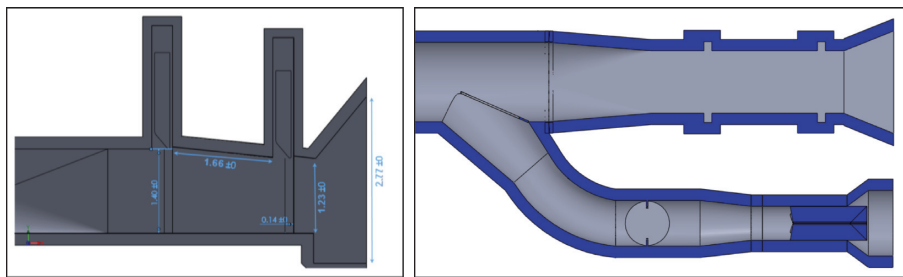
Details of construction of 3D geometry of Sardab Dam's bottom outlet (all dimensions are in m).
